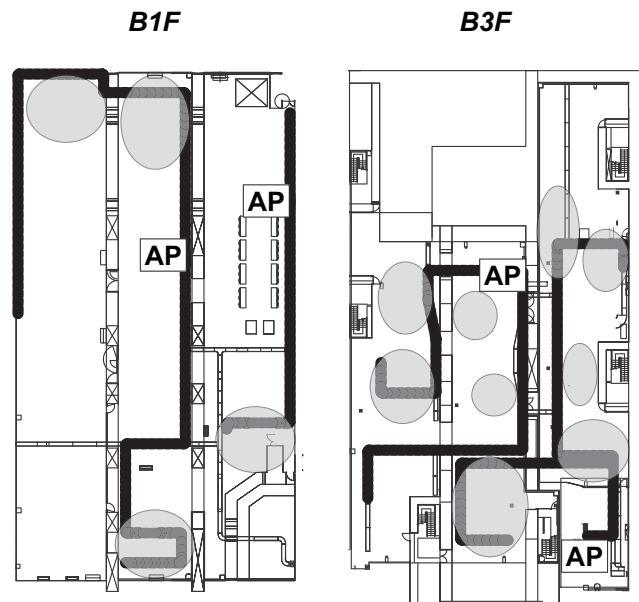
Wiring diagram for the B1F and B3F measurement rooms in the RIBF building.
